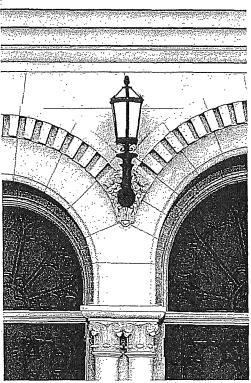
Exterior lighting fixture above main entrance on north façade (Rich Stapleton, 05/21/2018)
